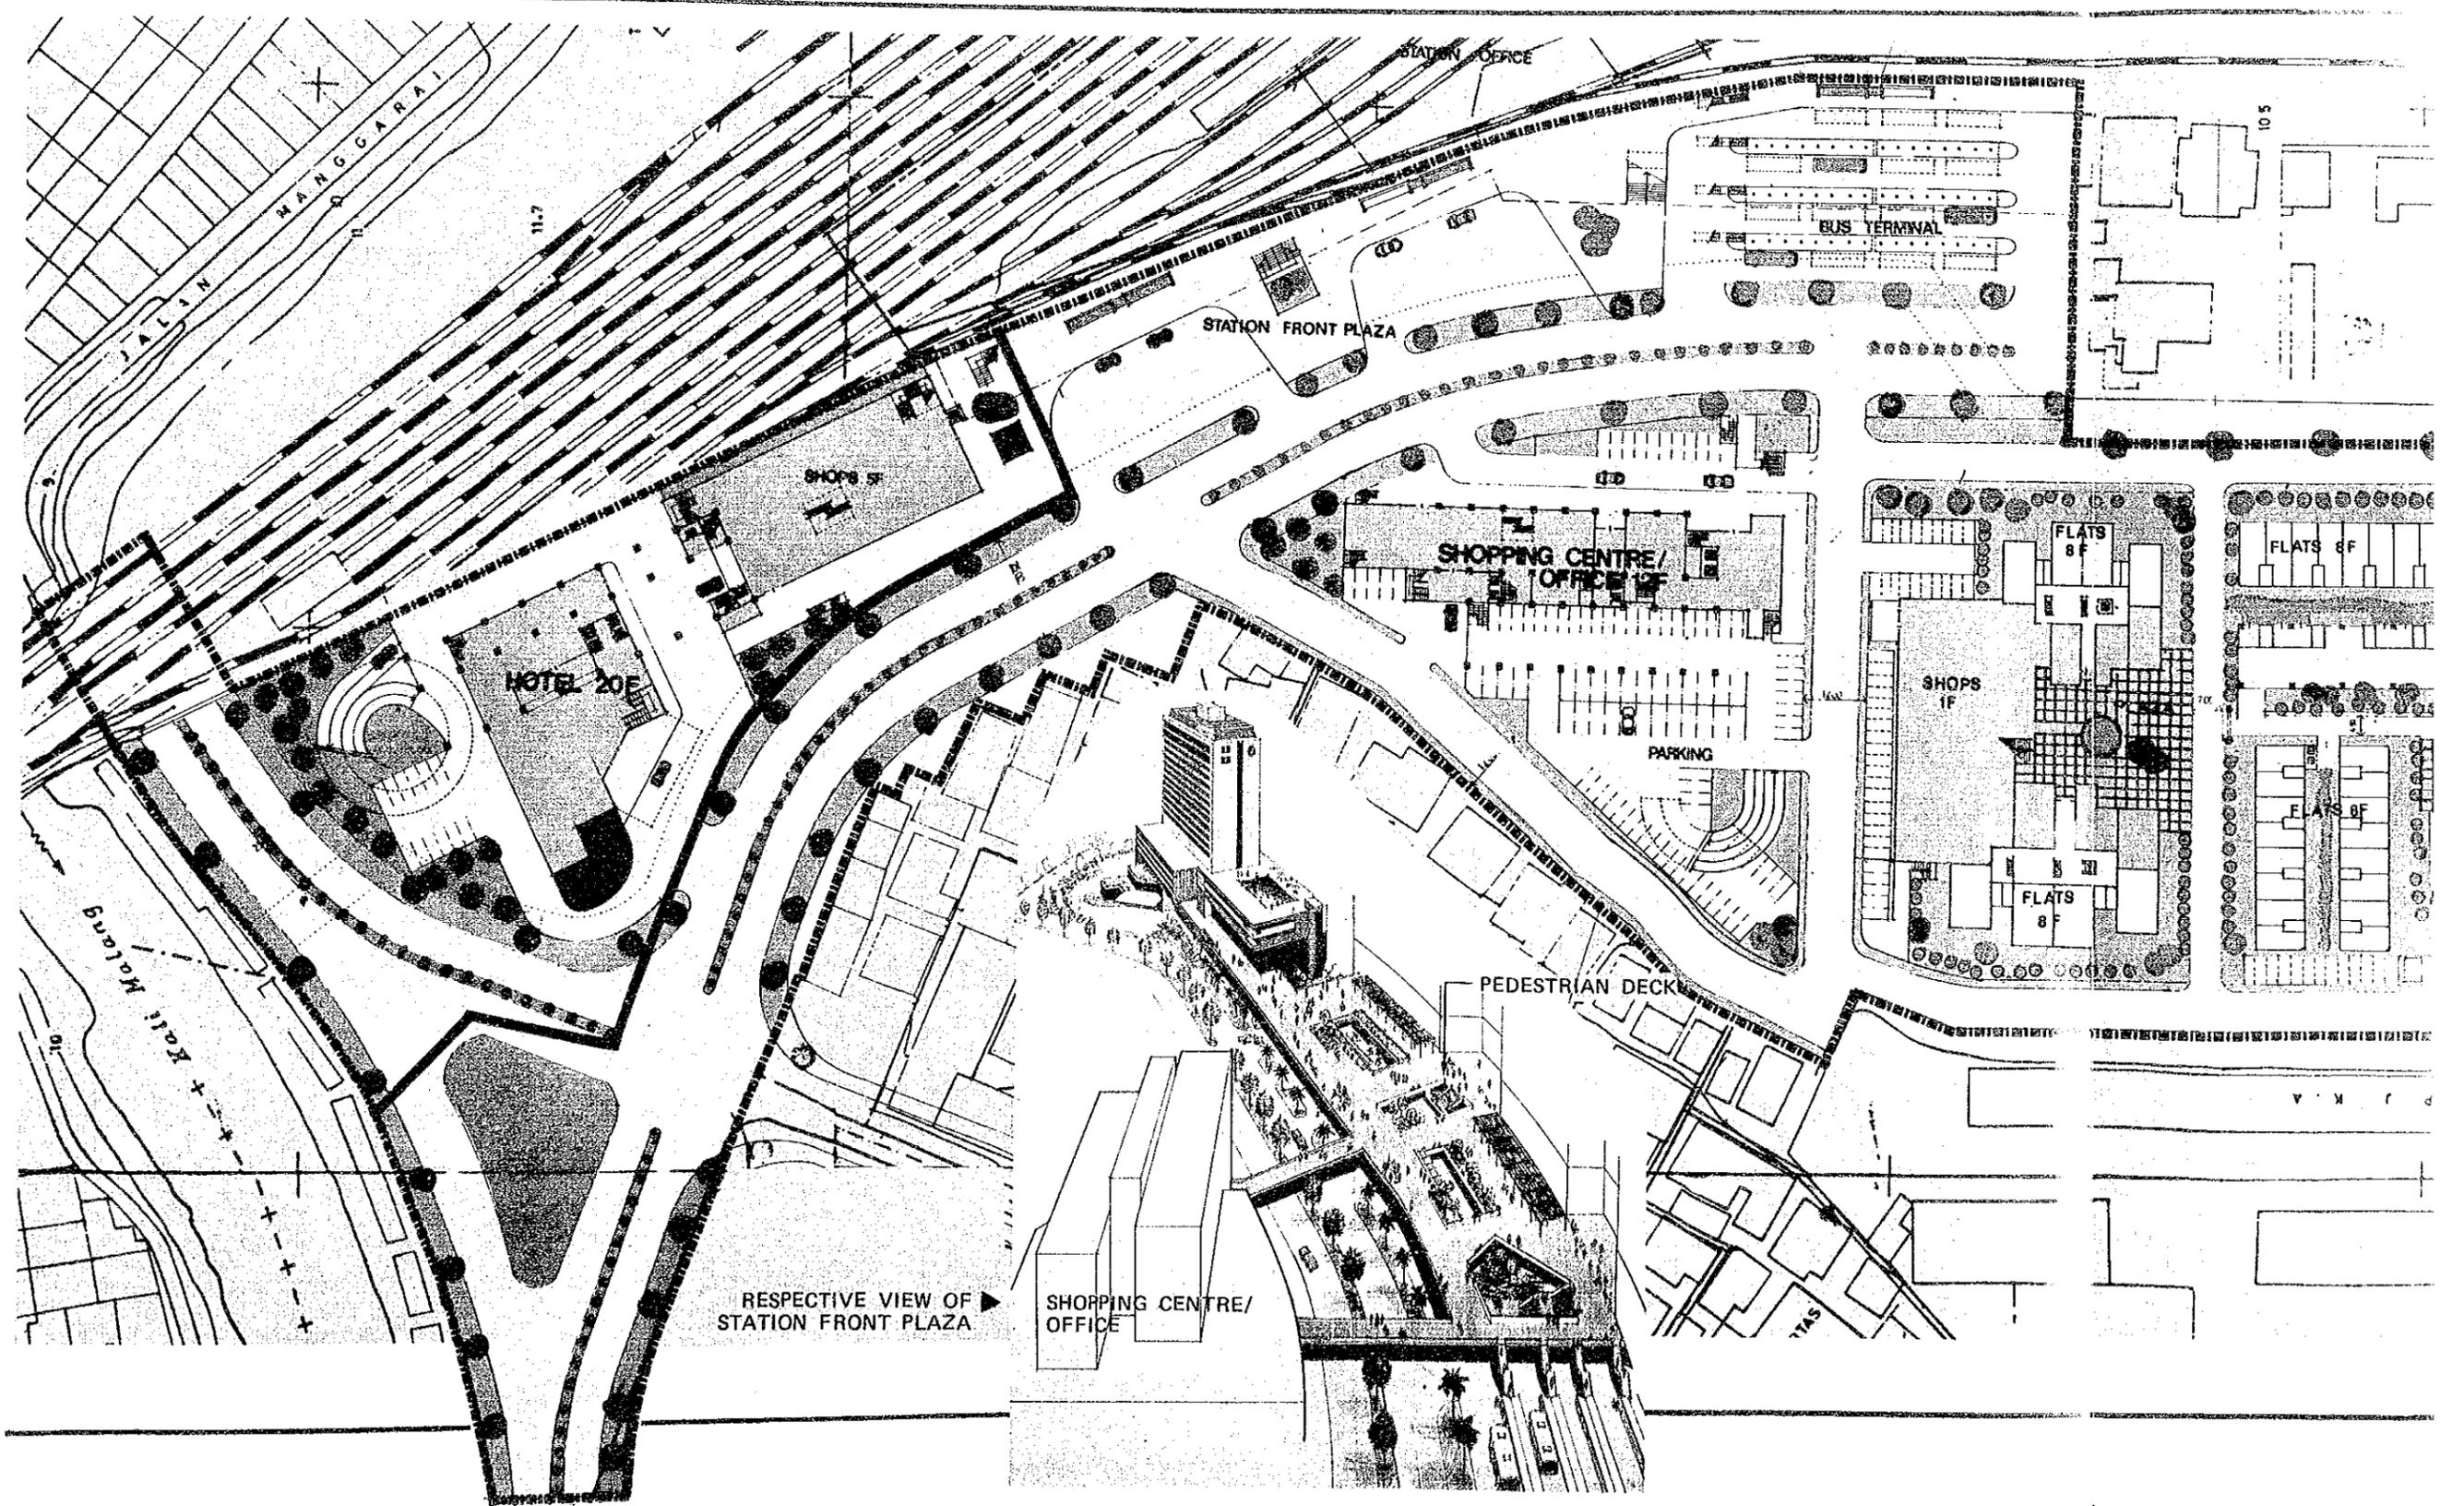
LAYOUT PLANNING - KEBON MELATI
